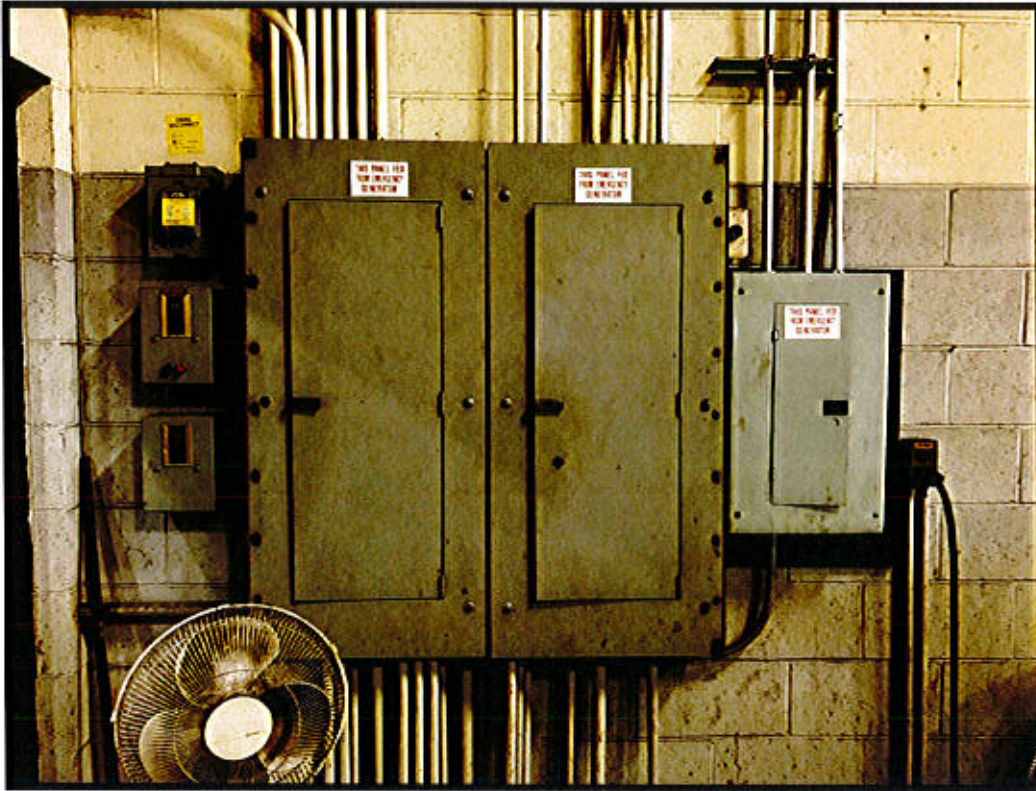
East Haven Repair Facility – 2100 N. High Street, East Haven, CT.
